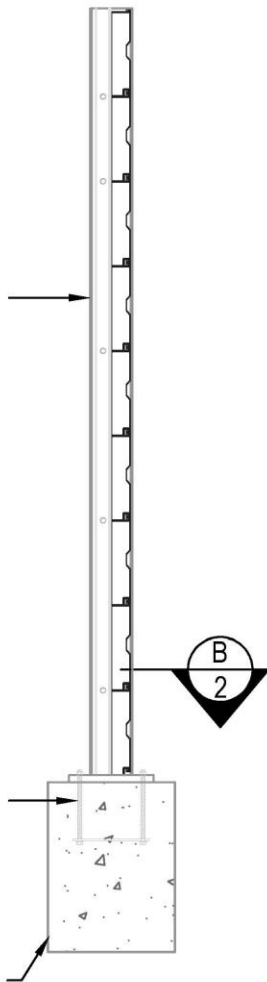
DETAIL: SILENT SCREEN ISOMETRIC SECTION
